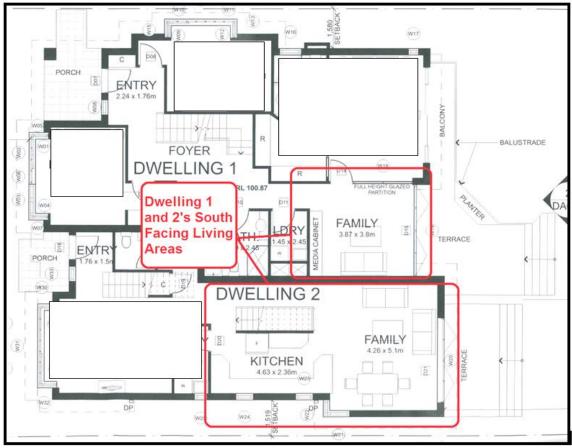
Image showing the ground level floor plan of 9 Eric Street, Eastwood. The floor plan indicates the south facing living areas of dwelling 1 and 2.
